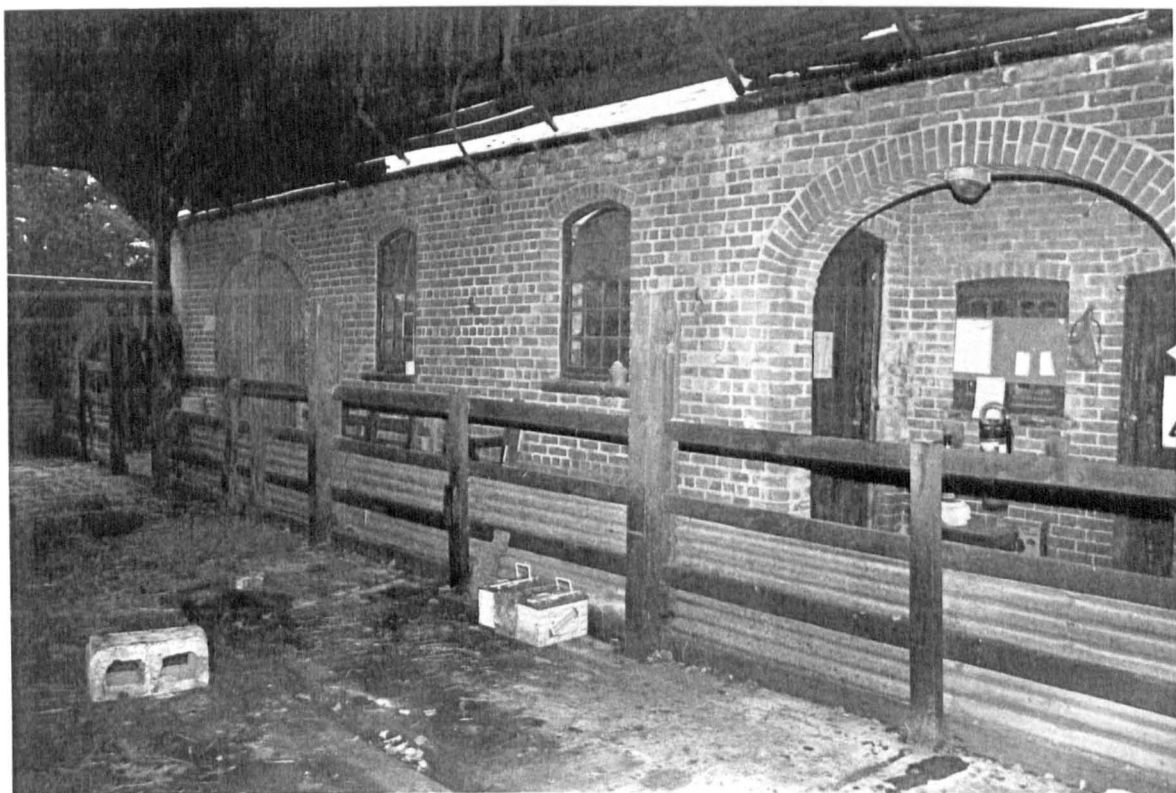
Brick arched windows and doors, stable range, Abbey Farm, Stixwould
